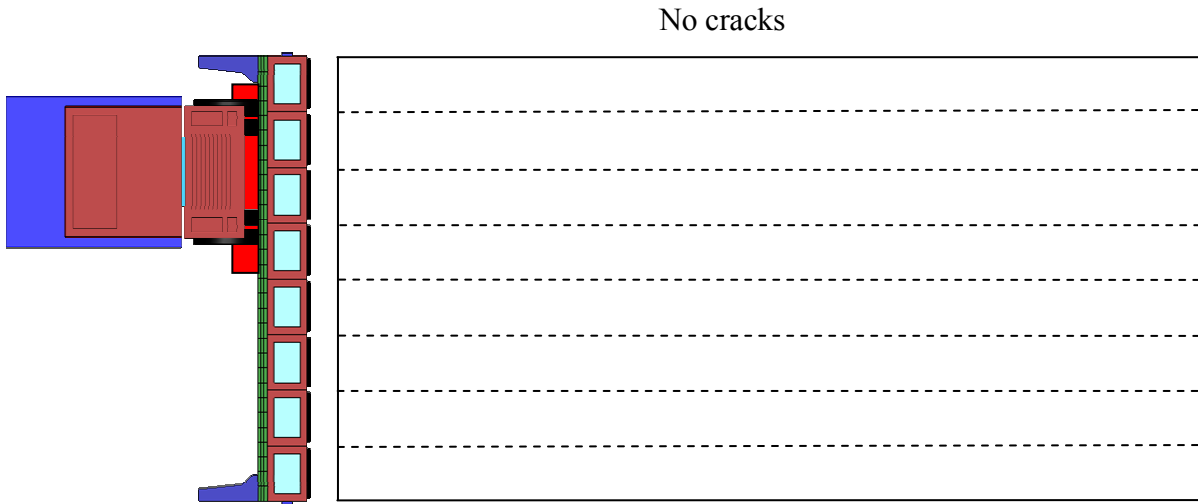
Crack development in the slab bottom surface after applying AASHTO HL-93 load.
